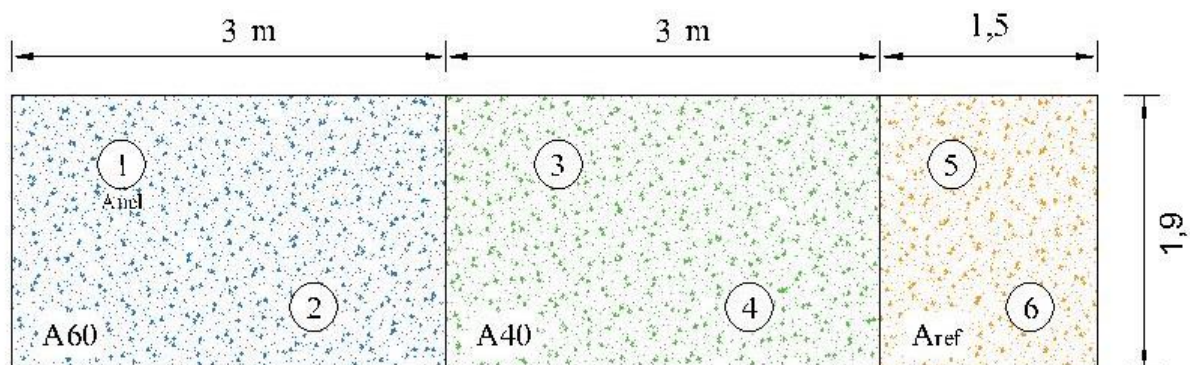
Sketch of test track in pervious concrete with construction waste.
